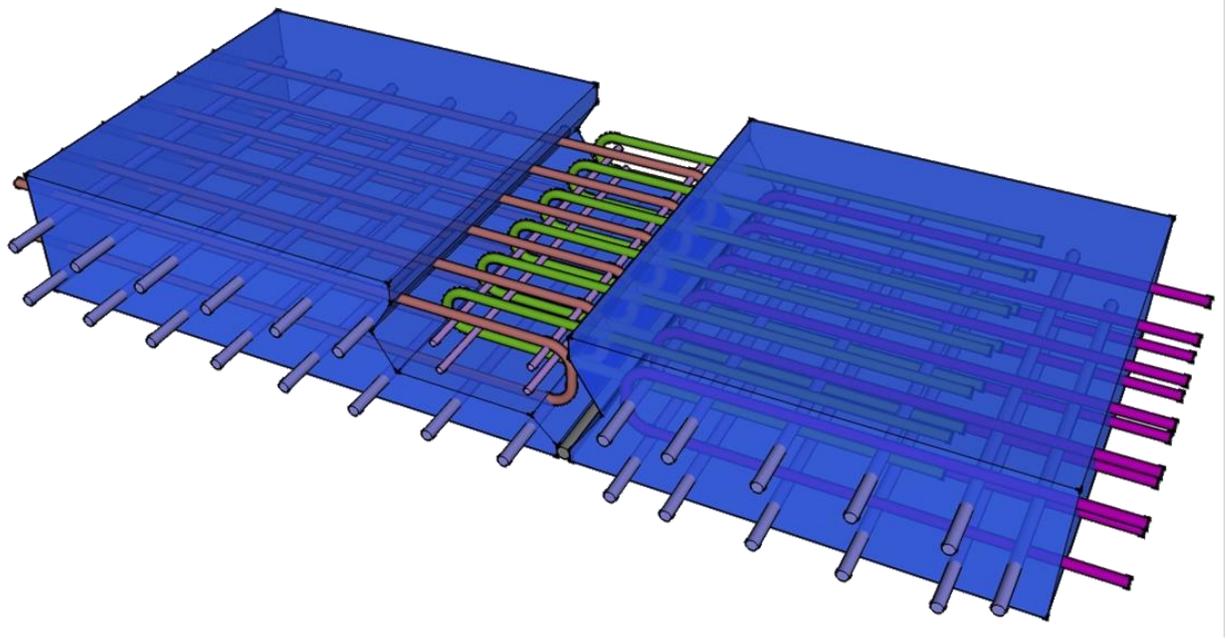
Transverse Joint Reinforcing Detail - orthogonal view
